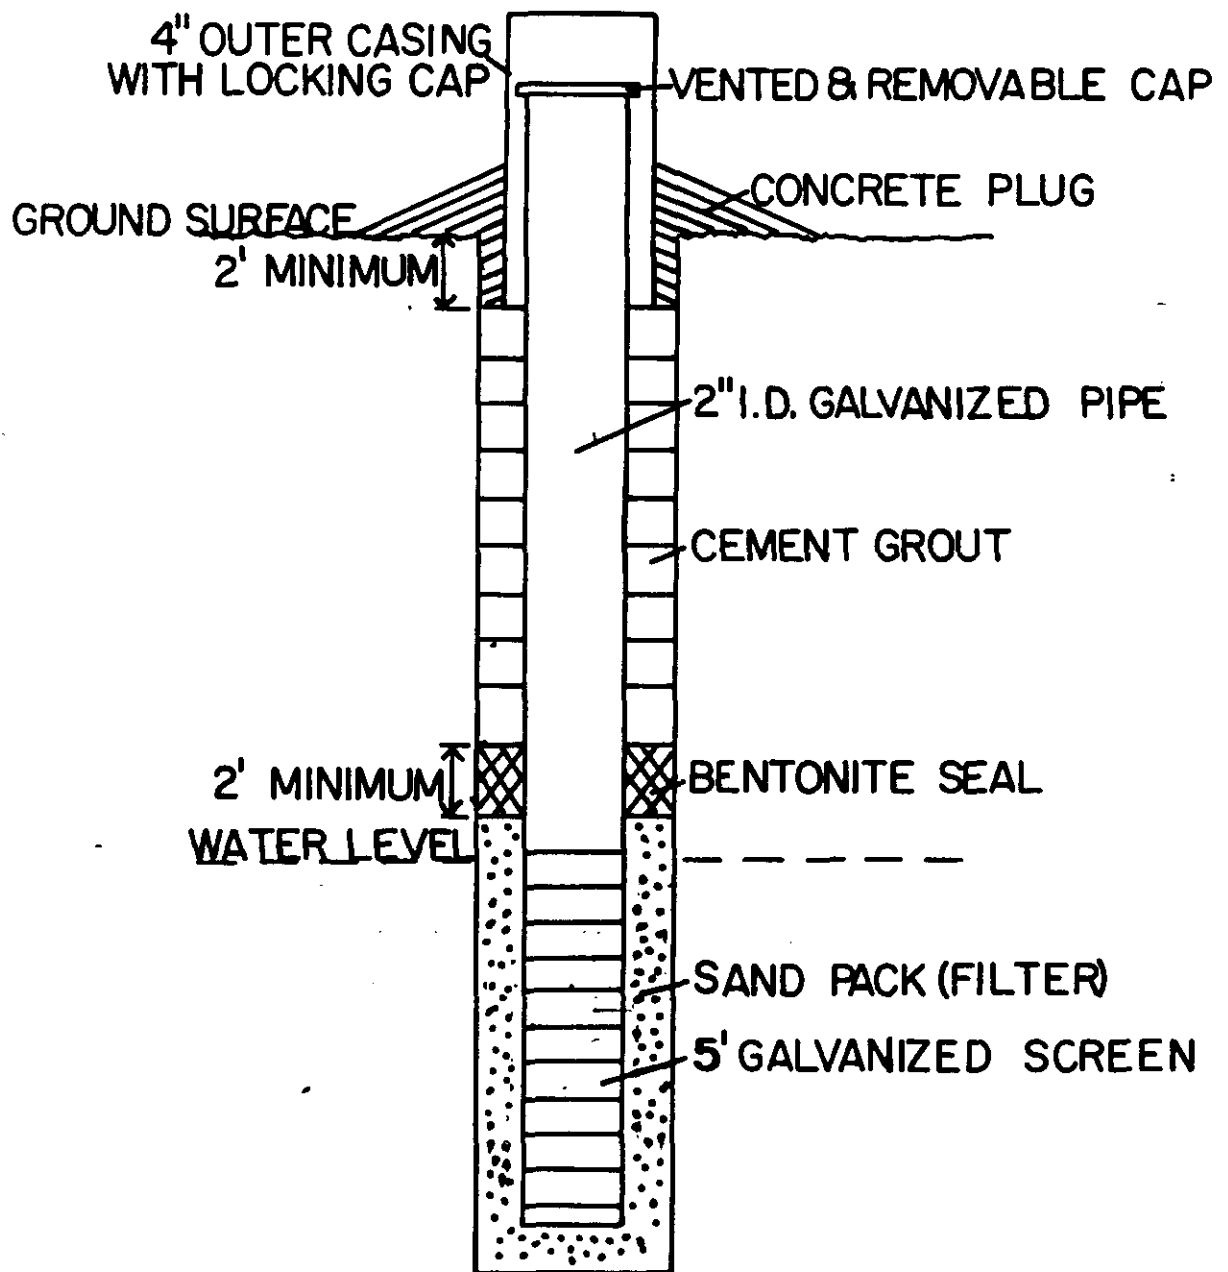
TYPICAL WELL CONSTRUCTION
